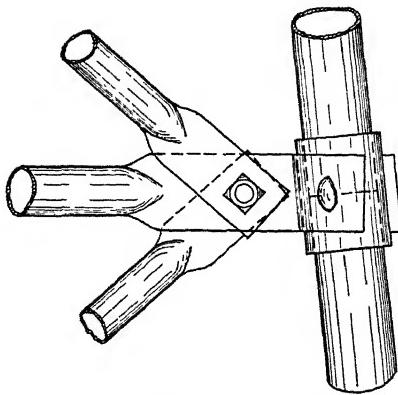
SIMPSON PIPE-DERRICK JOINT.
